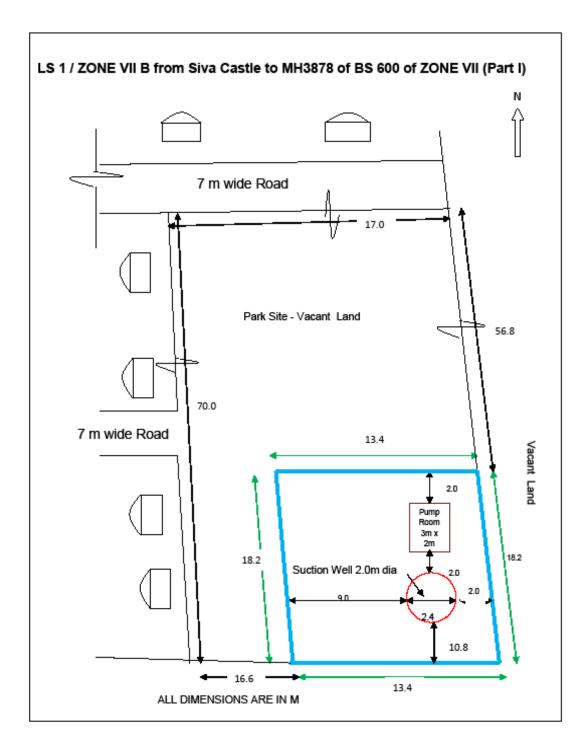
Site Set out Plans – Zone VII (Siva Csatle)
